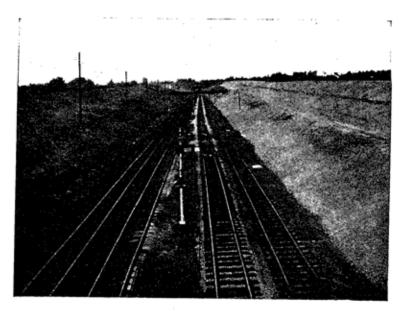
Pilning Cutting. Completion of Widening of Cutting. (Problem 40.)
